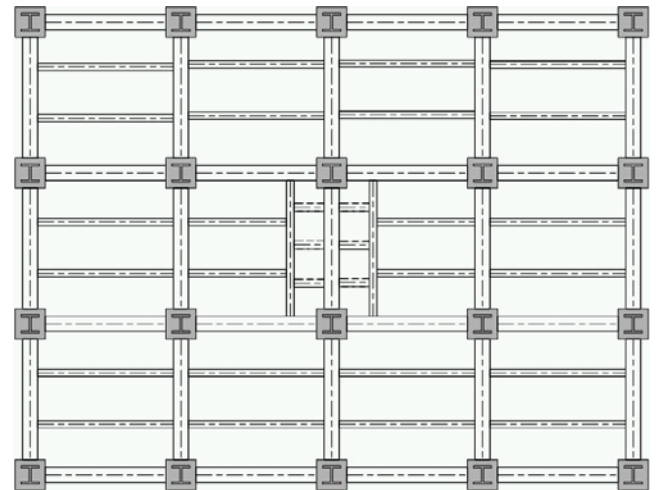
Typical Framing Plan for a Multistory Steel Framed Building
